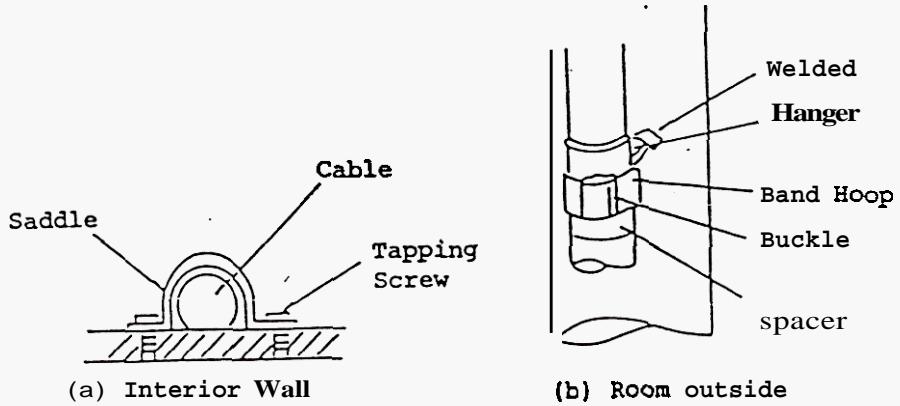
Fastening Cable to Bulkhead or Structural Member
